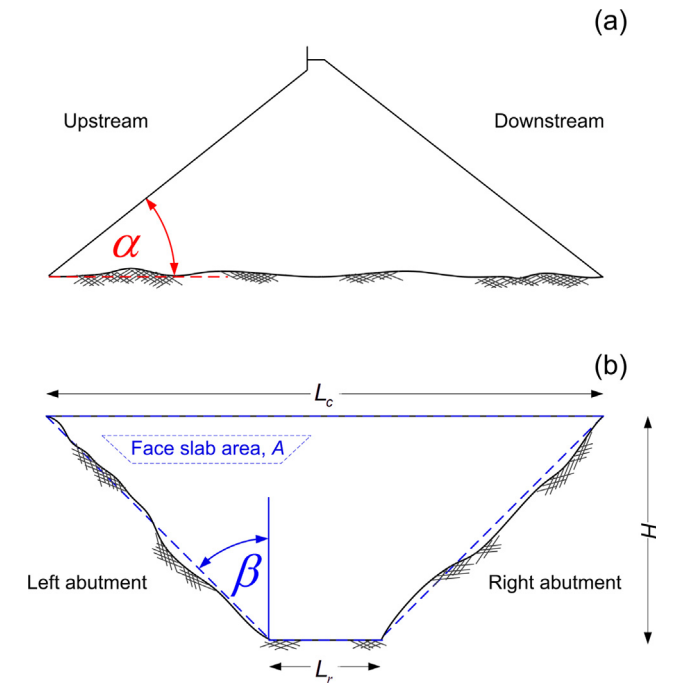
(a) Typical dam section (b) Longitudinal dam cross section and lay parameters.
